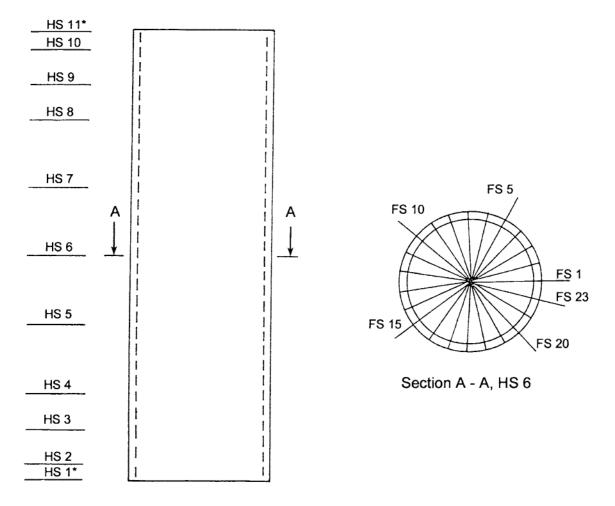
Division of a cylindrical shell in design sections.\* The section forces in the border sections are determined by extrapolation
